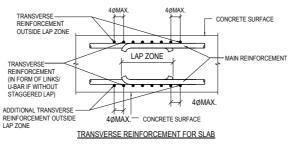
DETAILS OF MINIMUM TRANSVERSE REINFORCEMENT IN LAP ZONE
